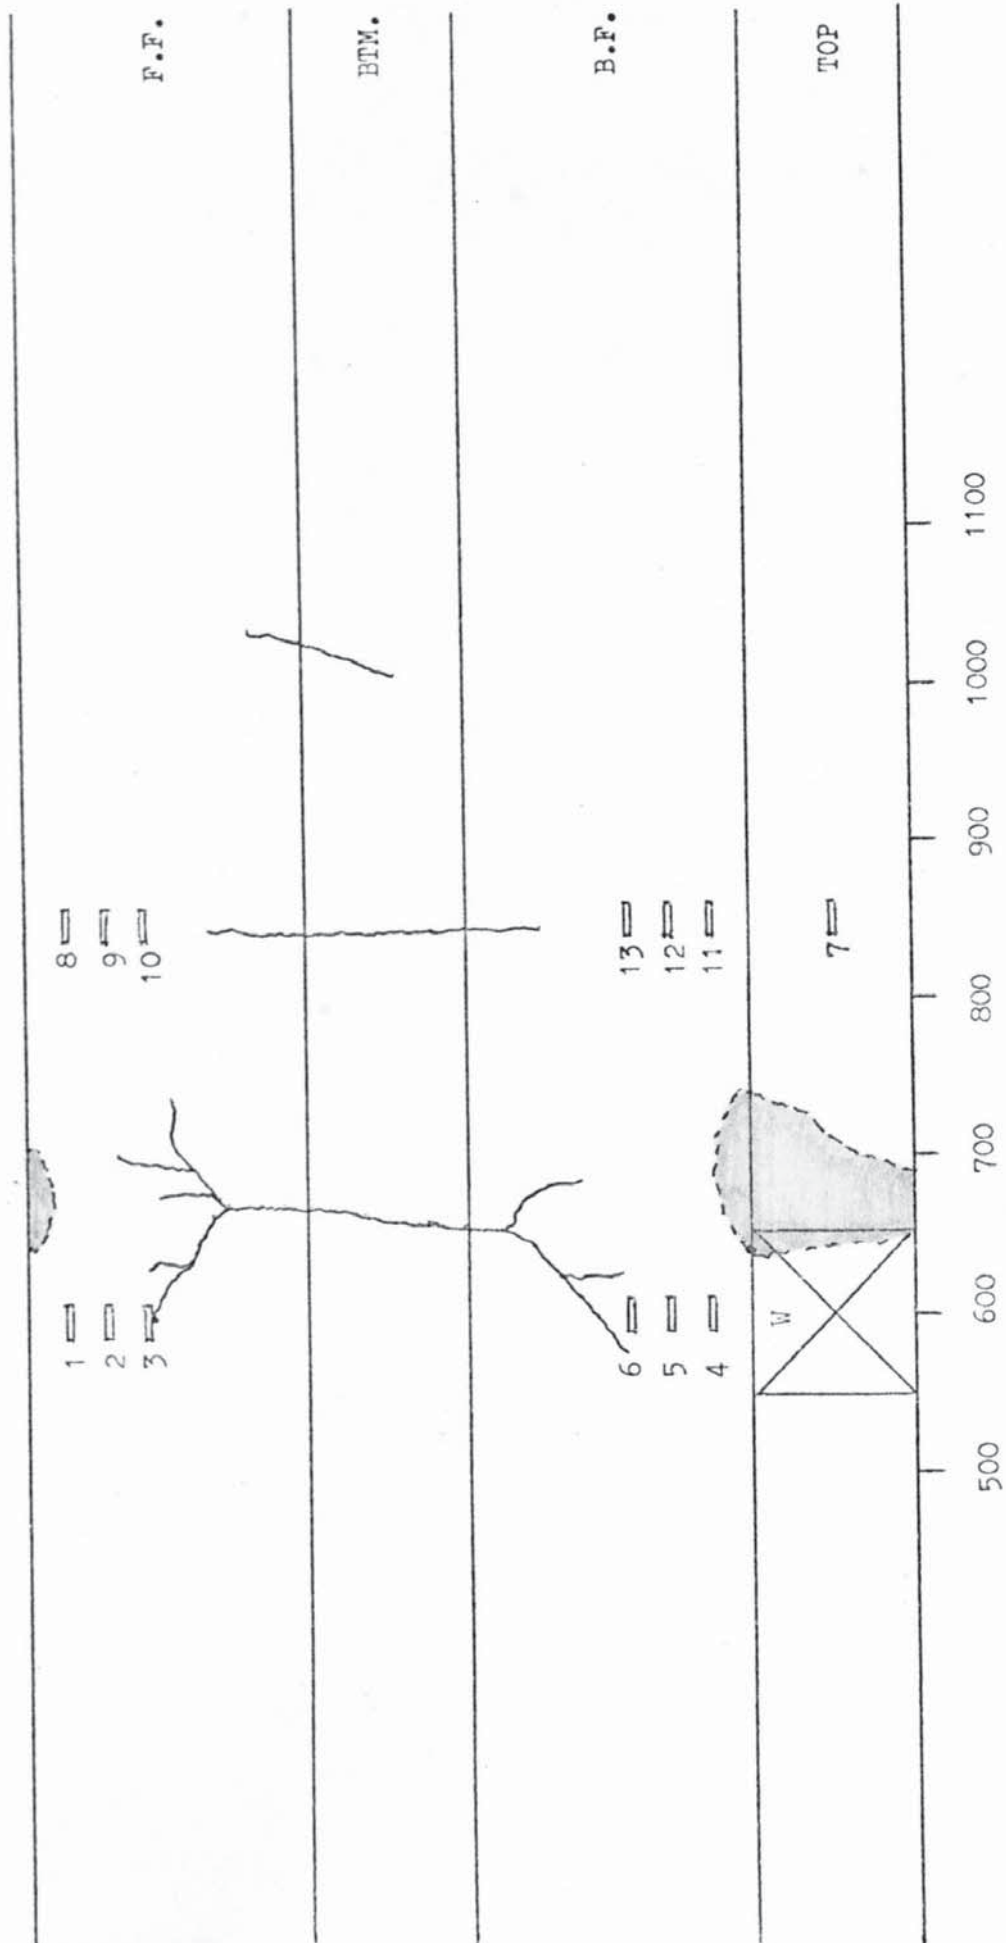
FAILURE CRACK PATTERNS - BEAM 16 (MODE 1)
